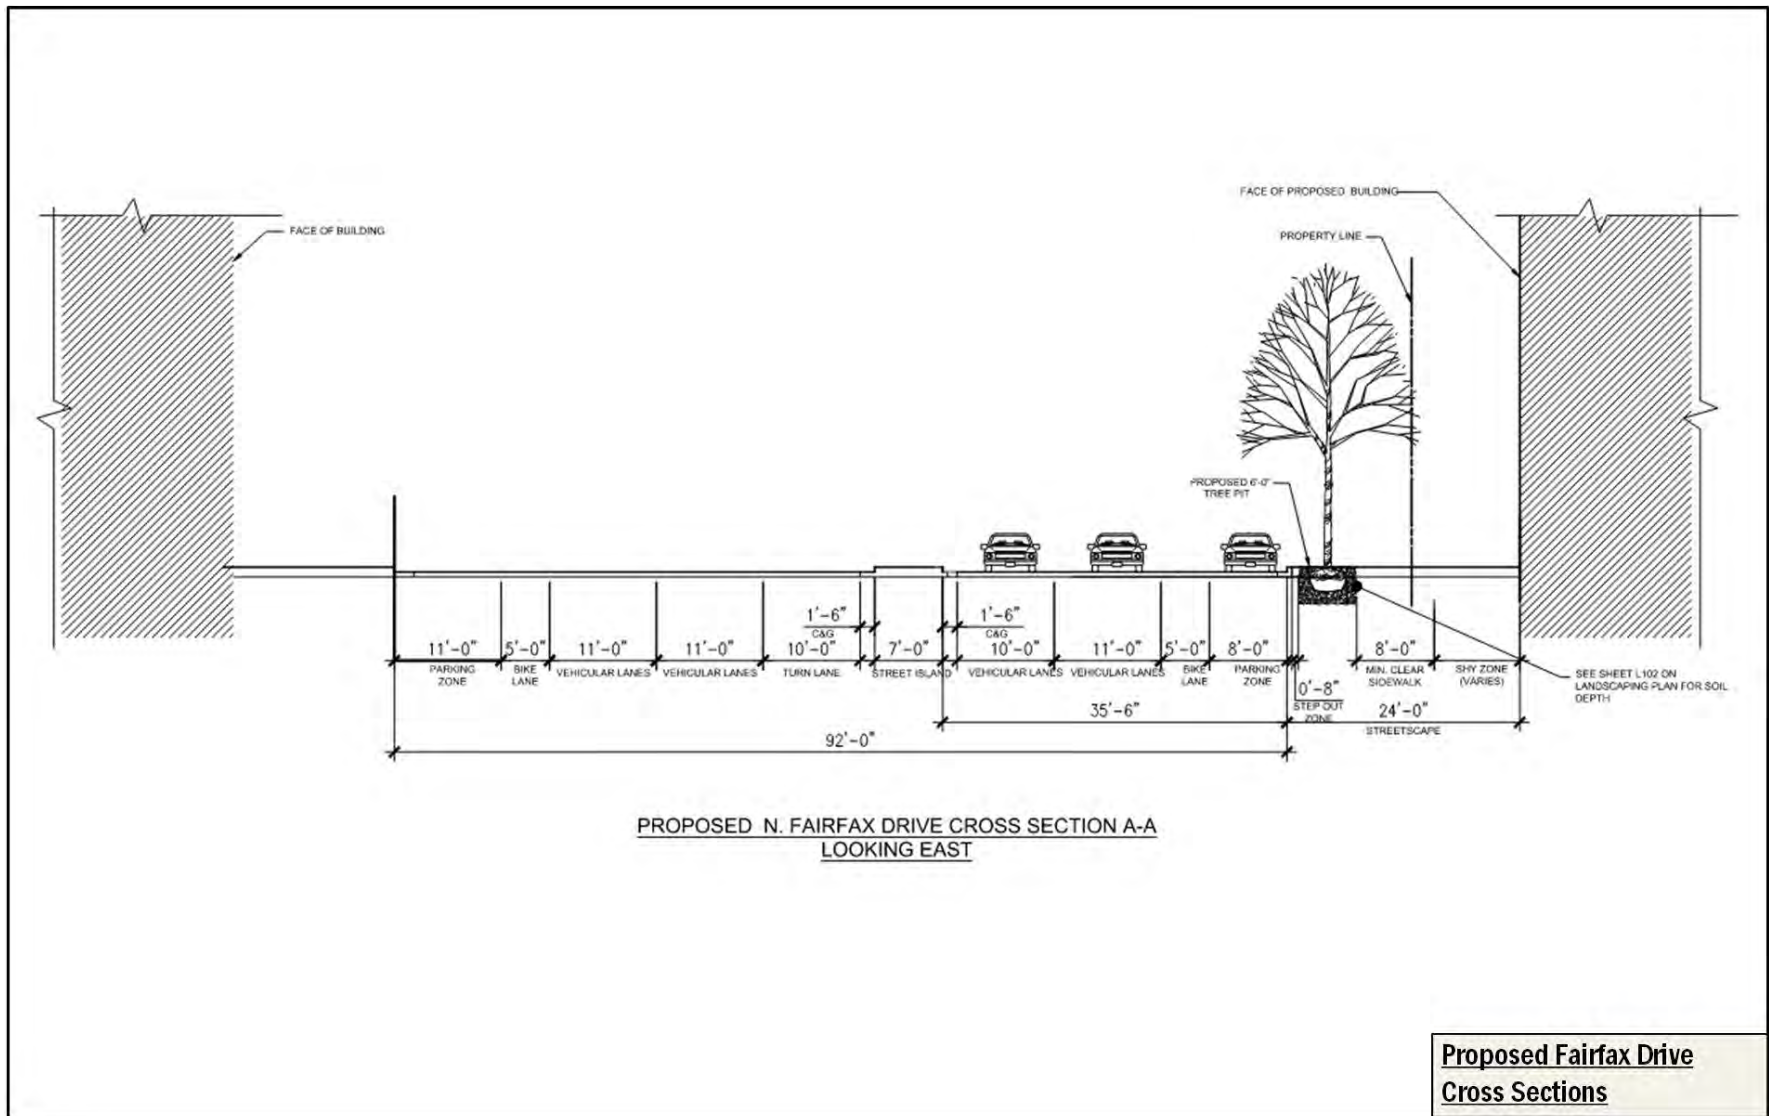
Proposed Fairfax Drive Cross Sections (A-A)
